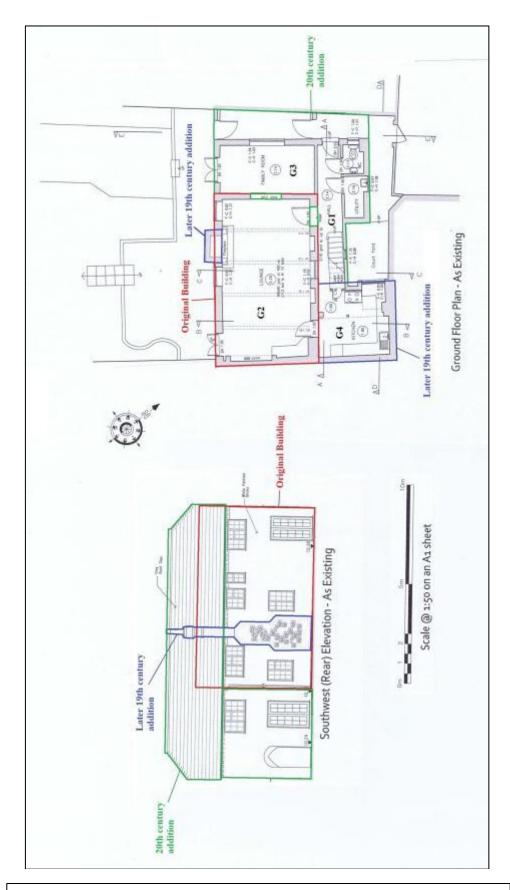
Tower House, Hurstpierpoint: Interpretation plan and elevation (Adapted from architects drawing)
